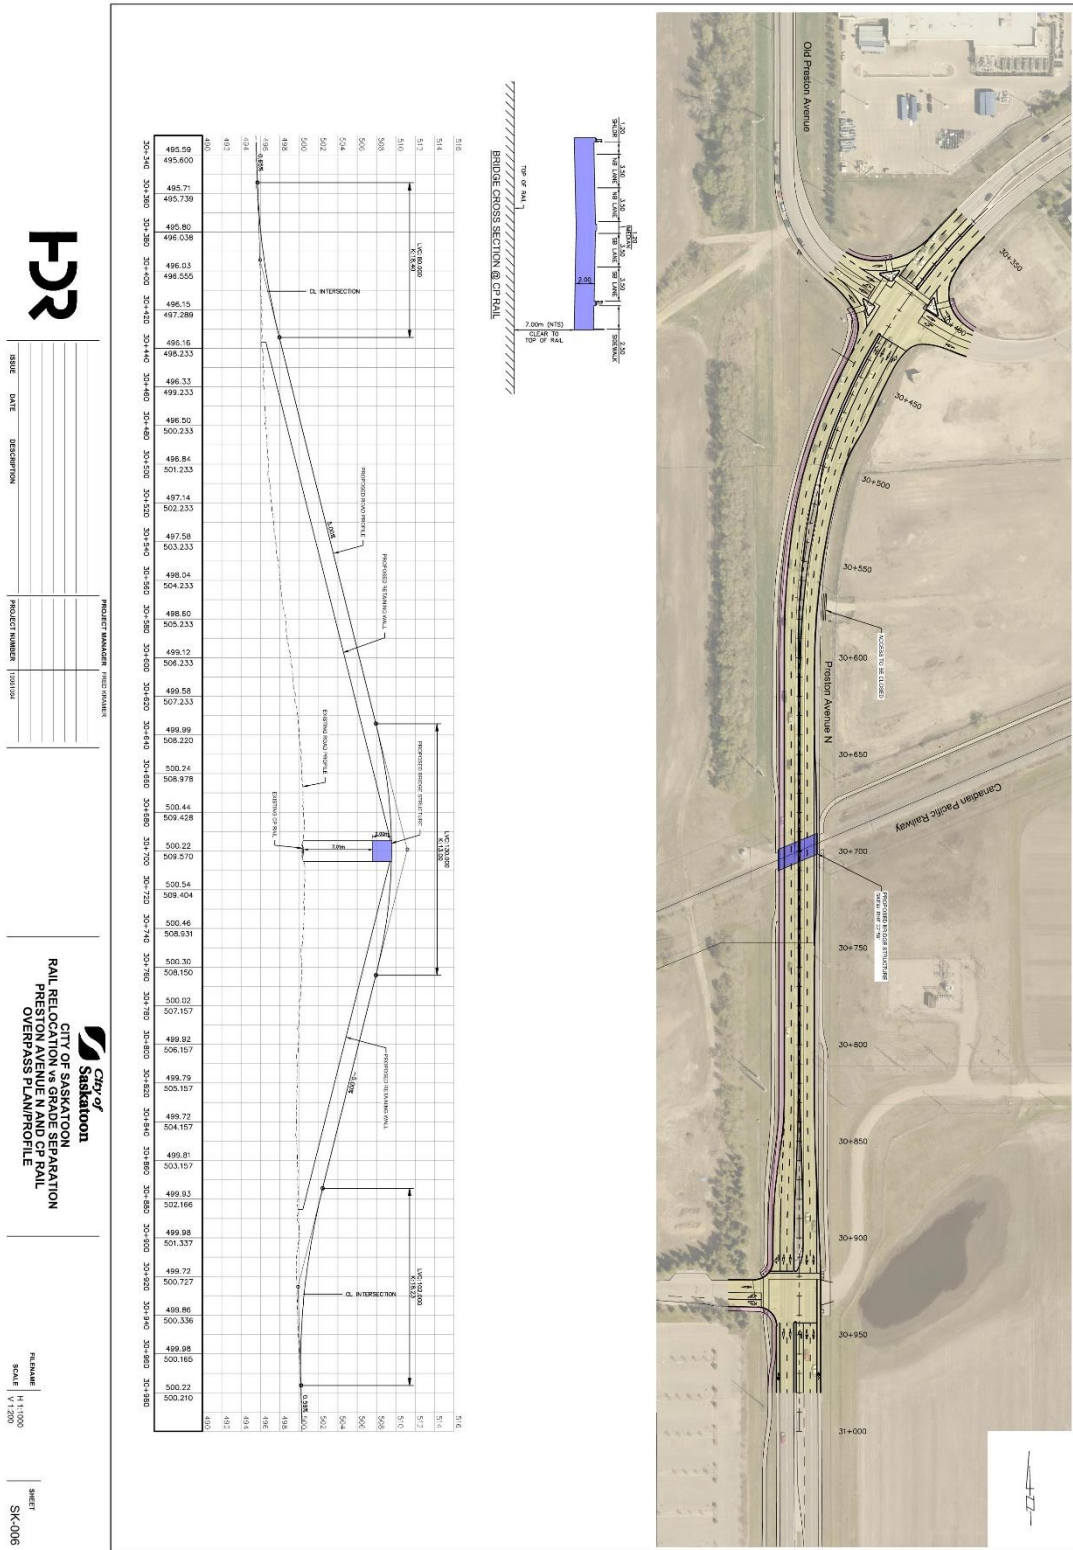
Proposed Conceptual Plan and Profile for Preston Avenue N @ CP
